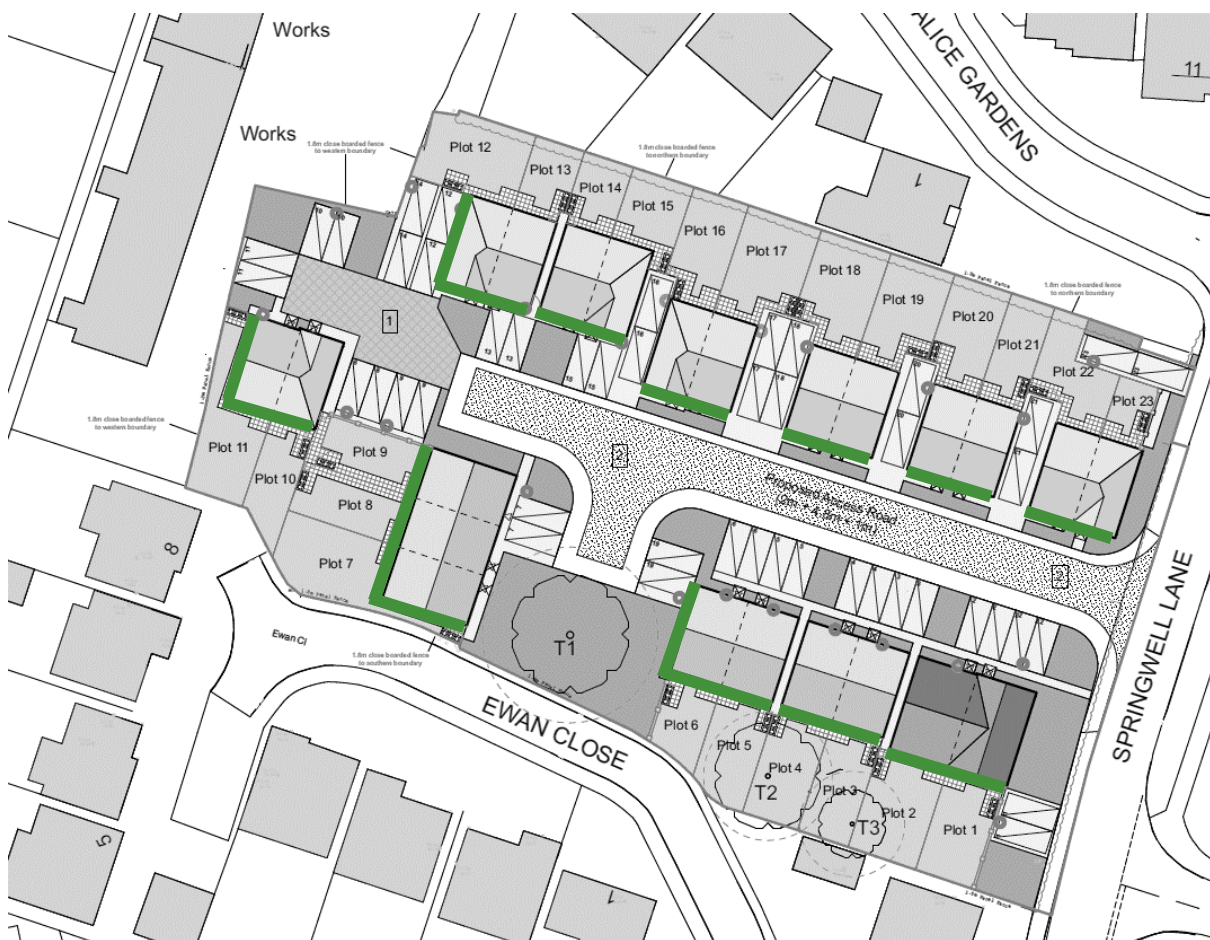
Proposed site layout showing elevations for possible bedroom Part O assessment in green
